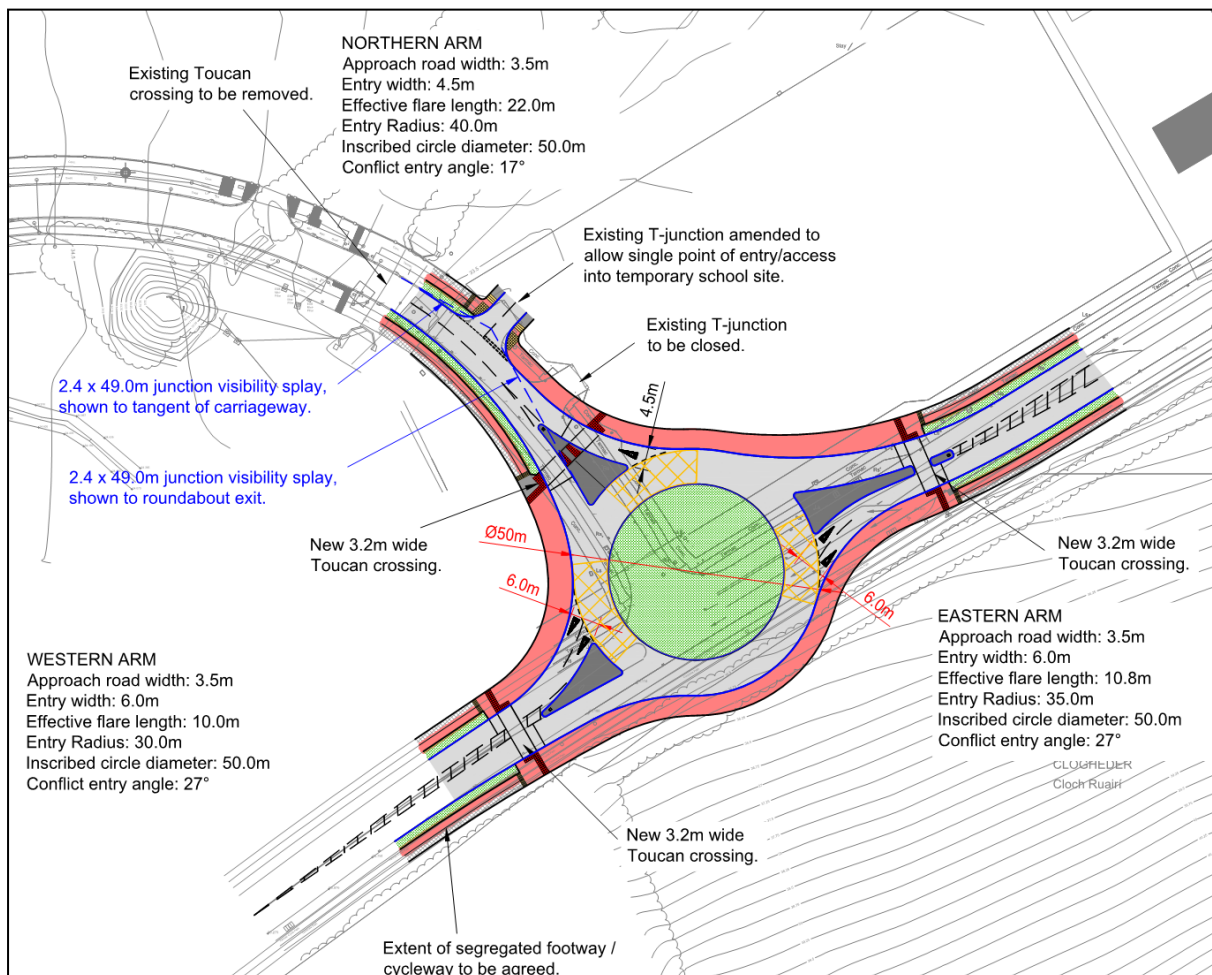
Proposed Clonard Road / Boulevard Road Three-Arm Roundabout
